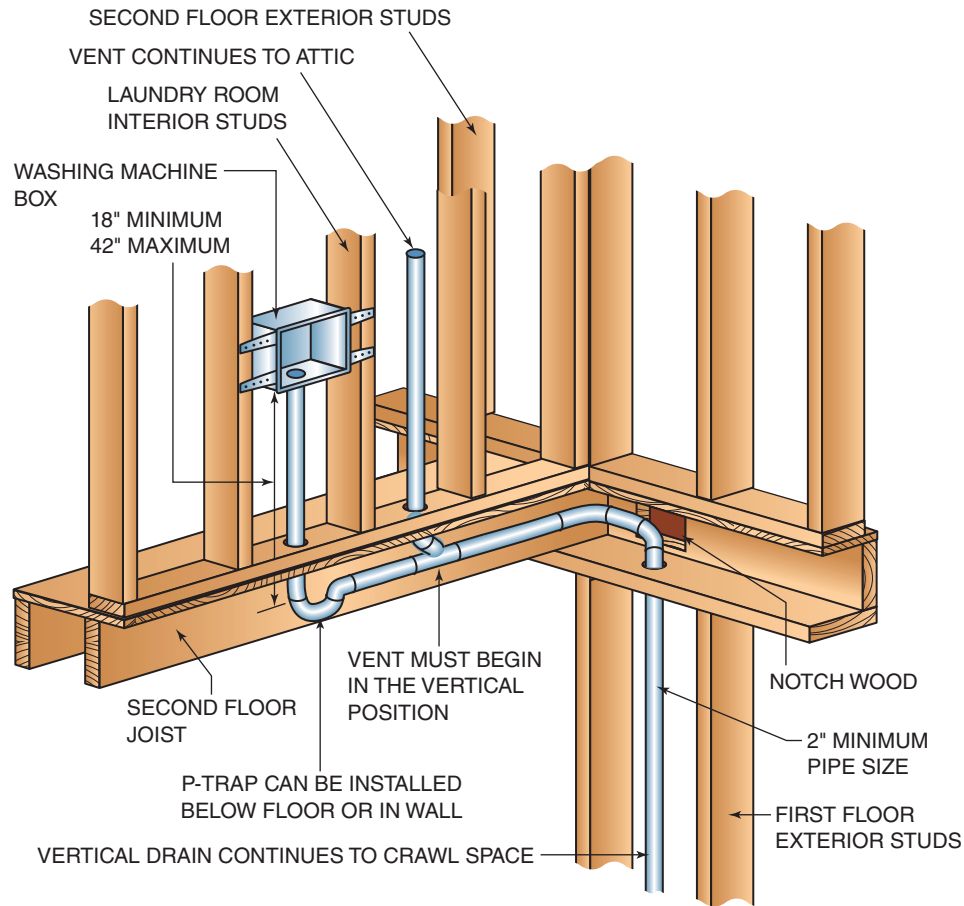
Installing piping in the same direction as the floor joists saves labor and does not weaken the structural integrity of the joist.
